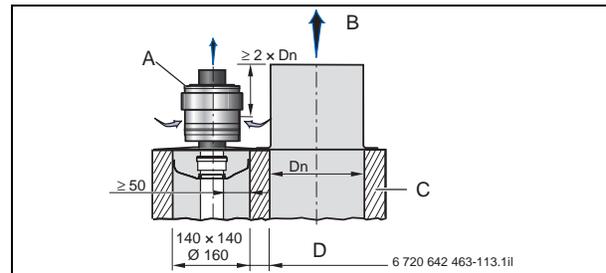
Minimum dimensions of the shaft cross-section and the shaft terminal for the flue (dim. in mm)
